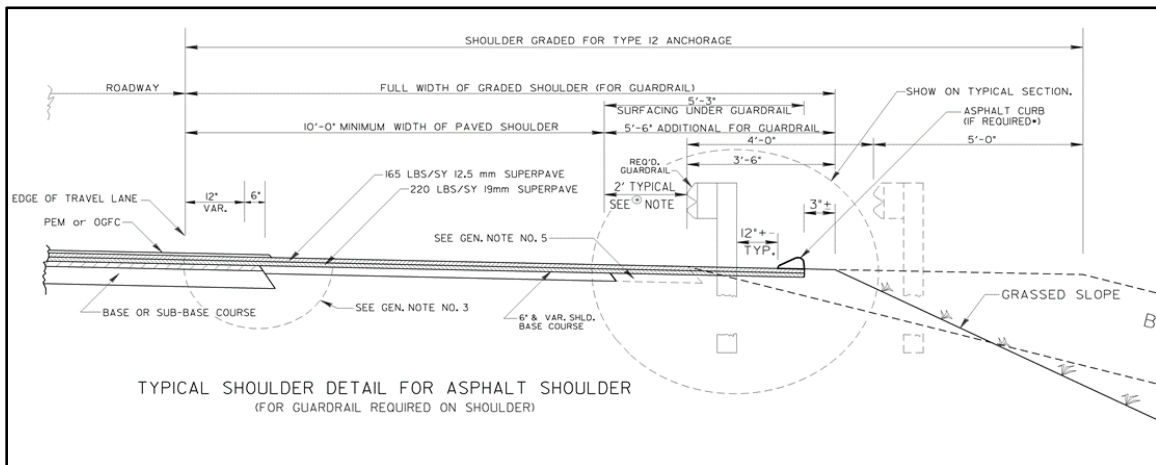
GDOT Drawing Detail S-4-2002 [2]
